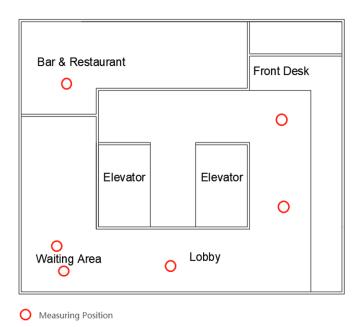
Harrah's New Orleans Hotel 1st Floor Plan with the Measuring Positions
